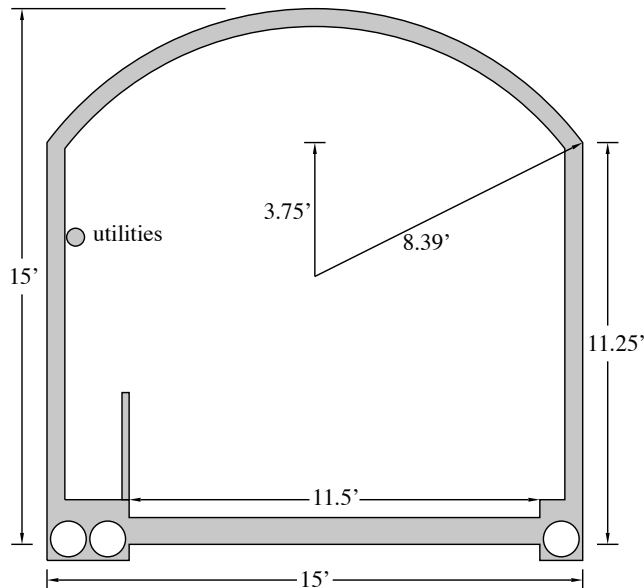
The schematic of the proposed profile of the Stage I entrance tunnel, after enlargement of the Pioneer tunnel, shotcreting, and concrete floors.
